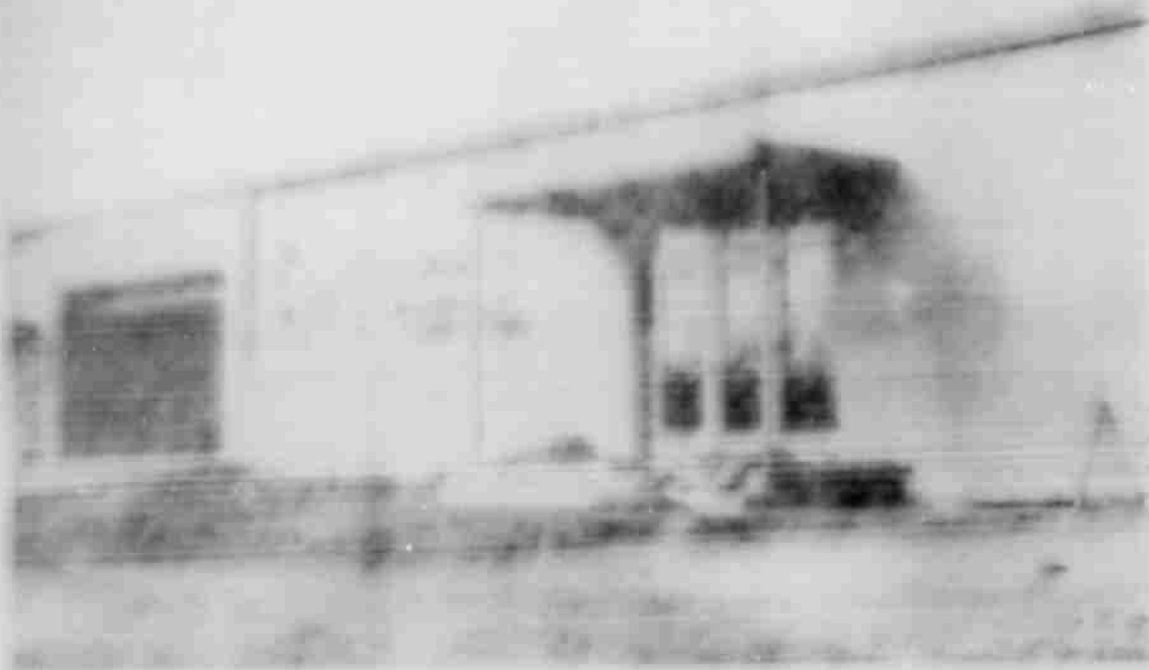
PHOTO ABOVE is the new Composite Agriculture building of the Sudan schools under construction. The large porch at the entrance to the shop area is shown in the foreground. The building is situated on the corner of 10th and 11th streets. (Scott Photo)
